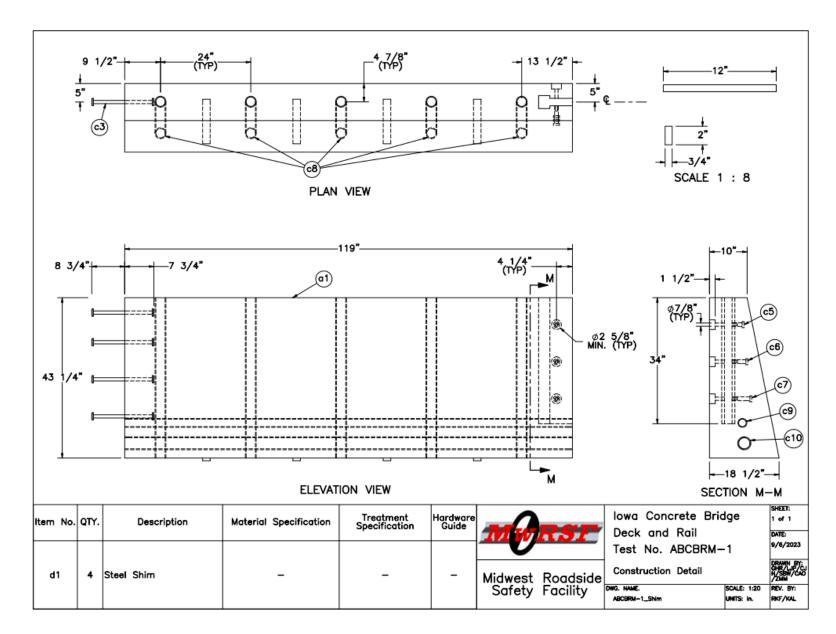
Steel Shim Construction Detail, Test No. ABCBRM-1
